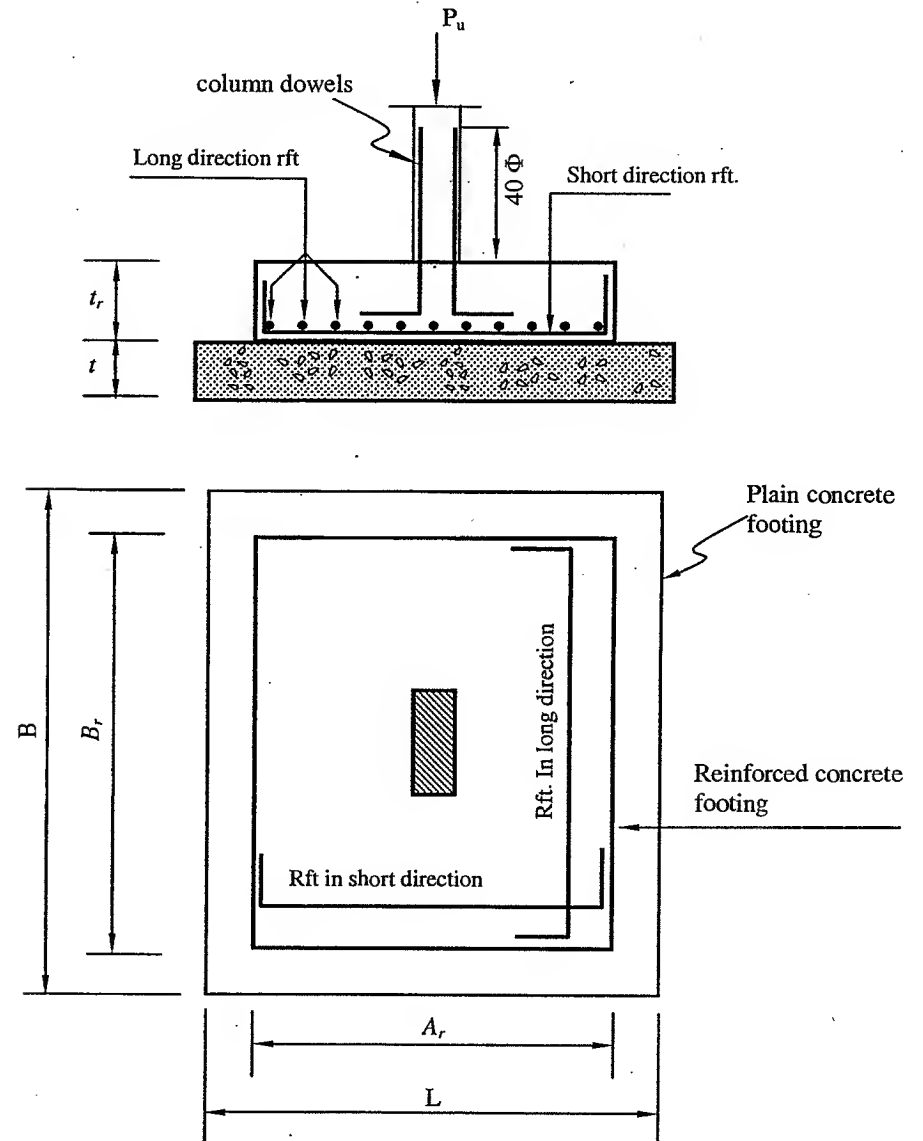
Typical reinforcement and dimensions of isolated footings
